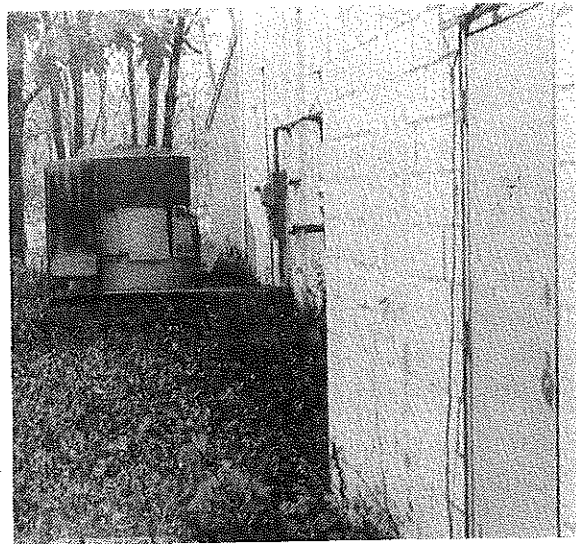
Air Conditioning unit behind the Plutonium Facility.
